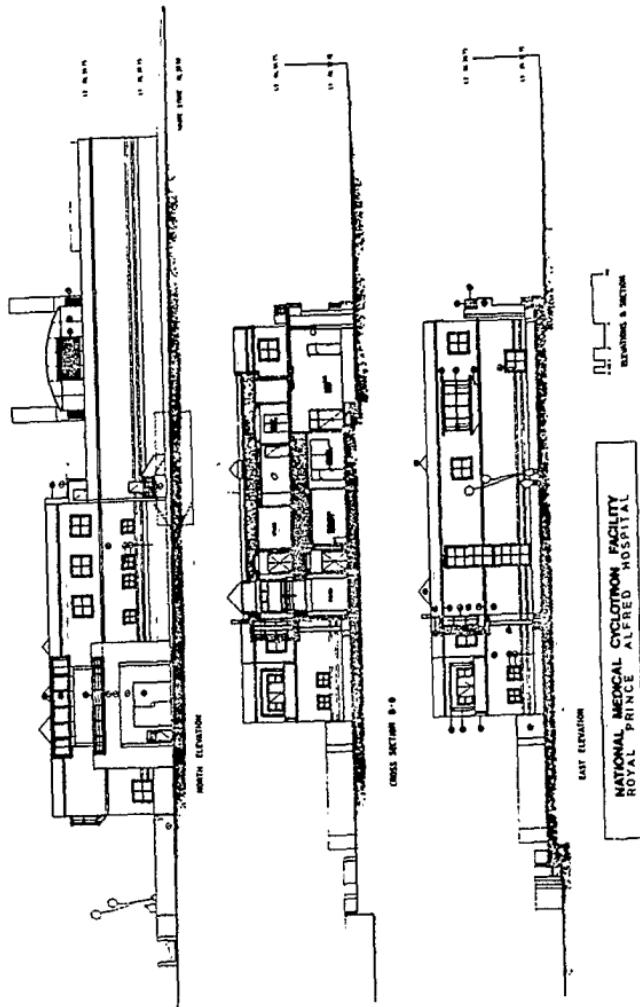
ELEVATIONS AND SECTION - NORTH AND EAST
